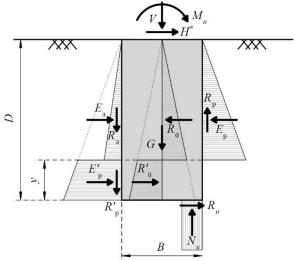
Earth pressures and base resistance N_u acting on the block foundation after Steckner (1989).
